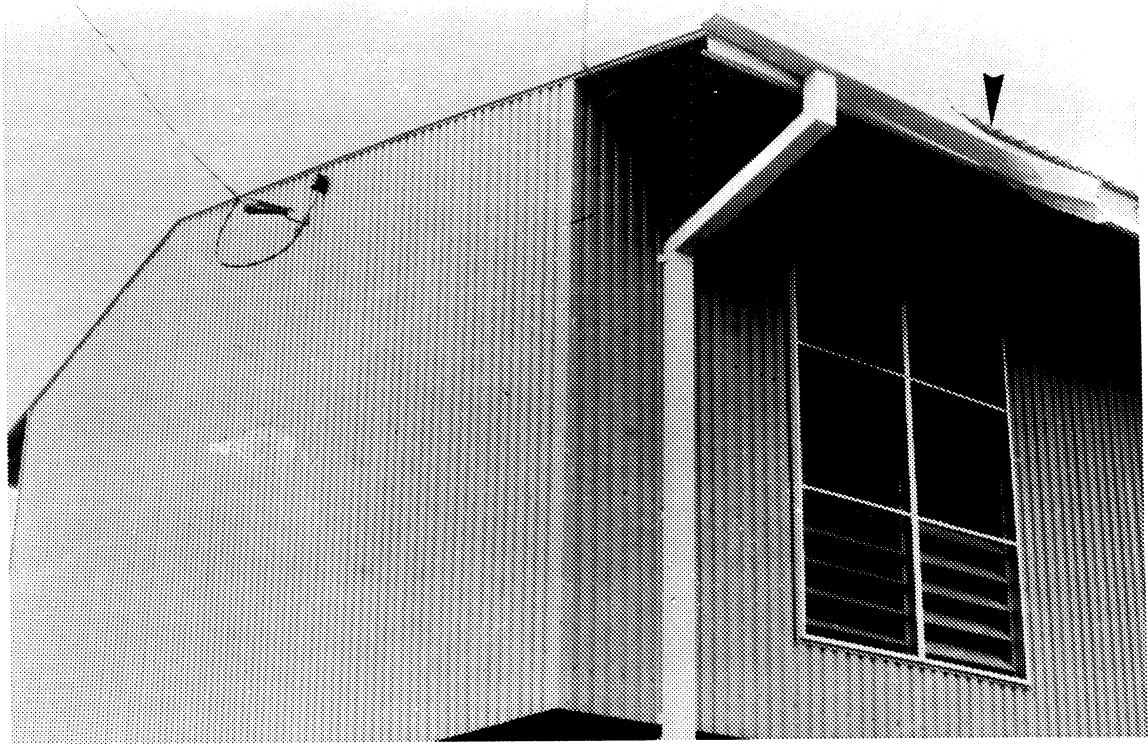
Police House showing damage to guttering, but screens and walls free from debris.
